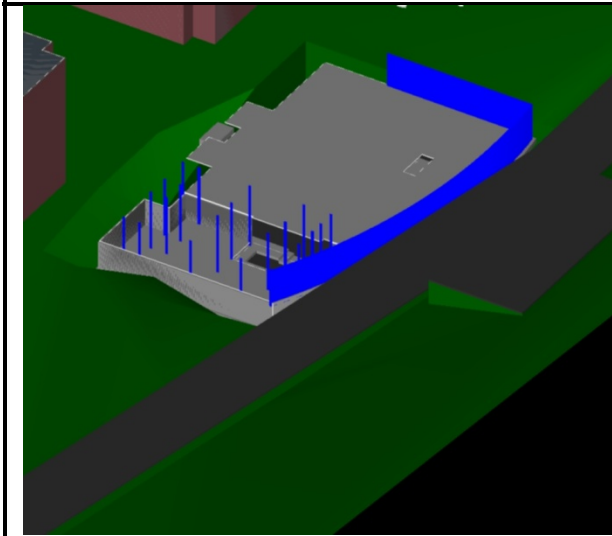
1st floor columns, Z1 & Z2, and foundation wall
